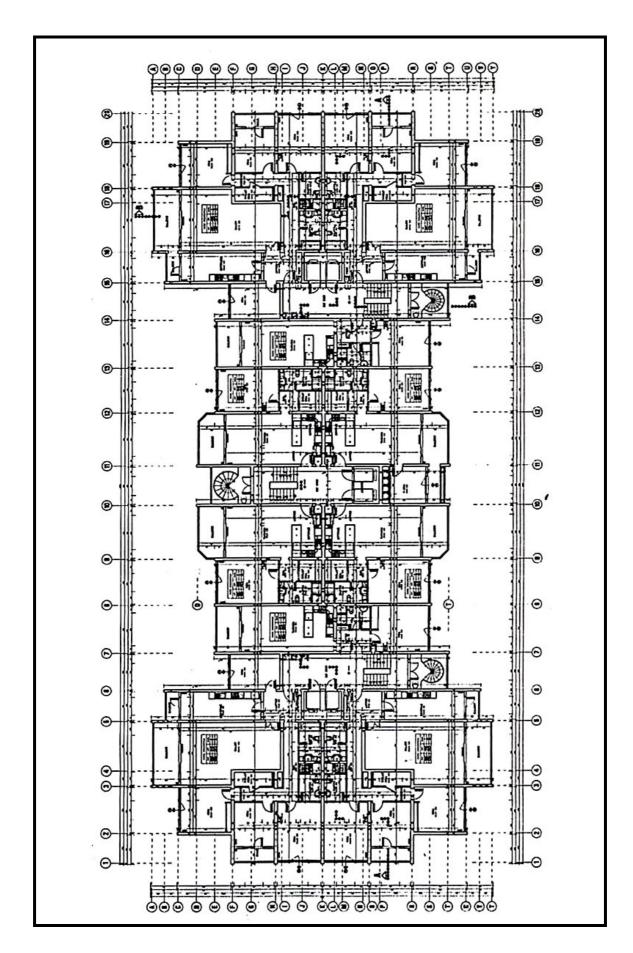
Mavişehir II; Kuğu 2nd – 4th Floor Plan
